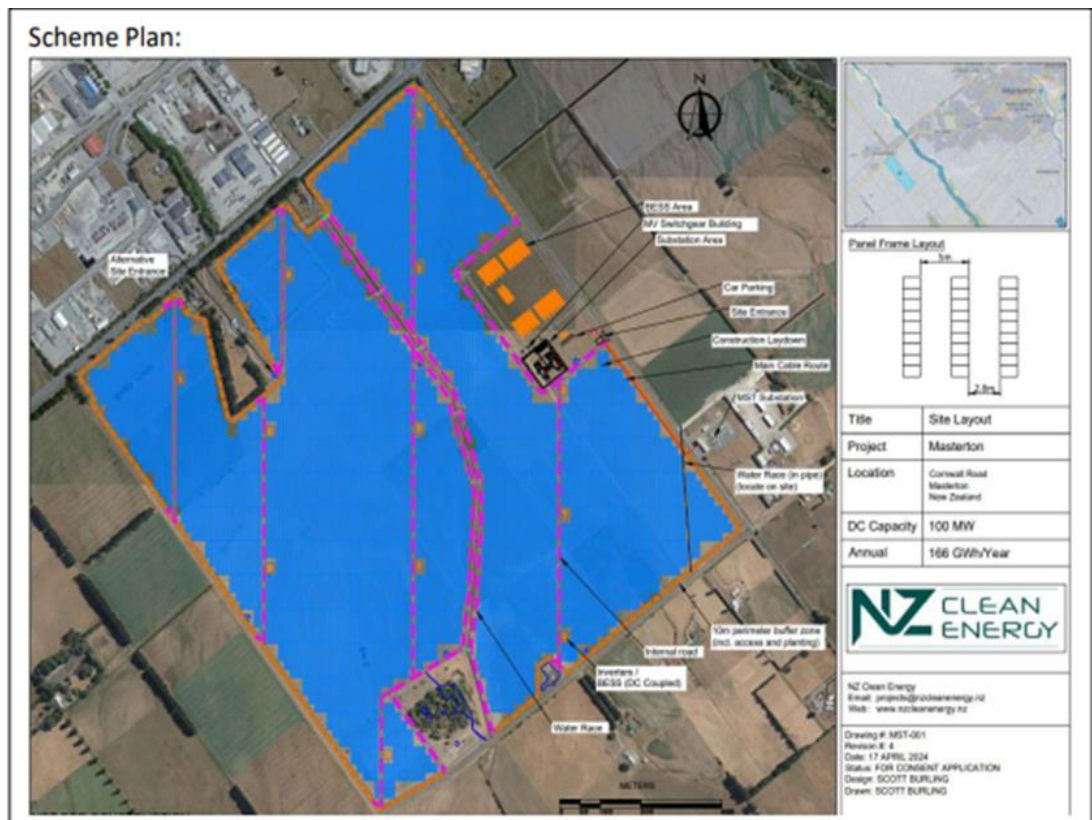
Scheme Plan showing BESS, layout of the solar panels, areas of vegetation to be retained and site access points.
